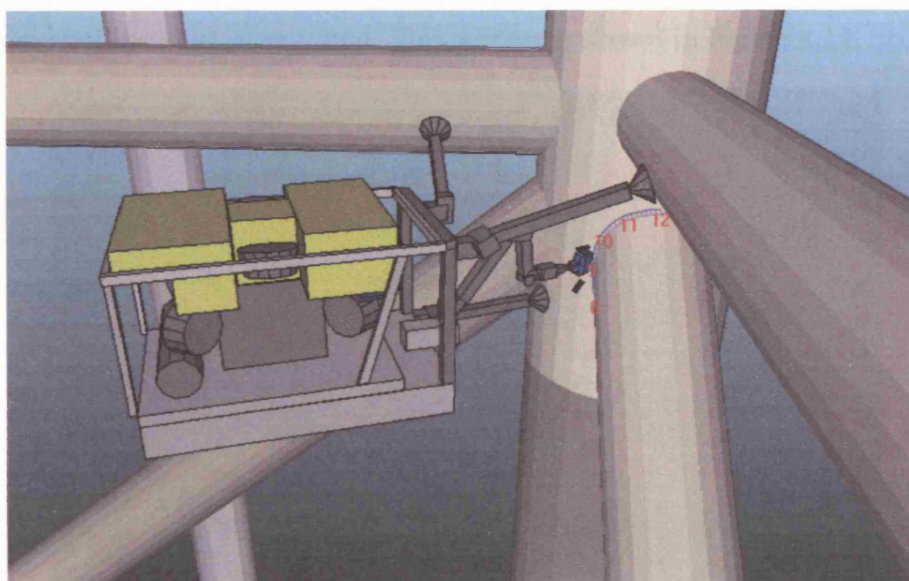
RovTech system inspecting 9 o'clock on weld 22A9
